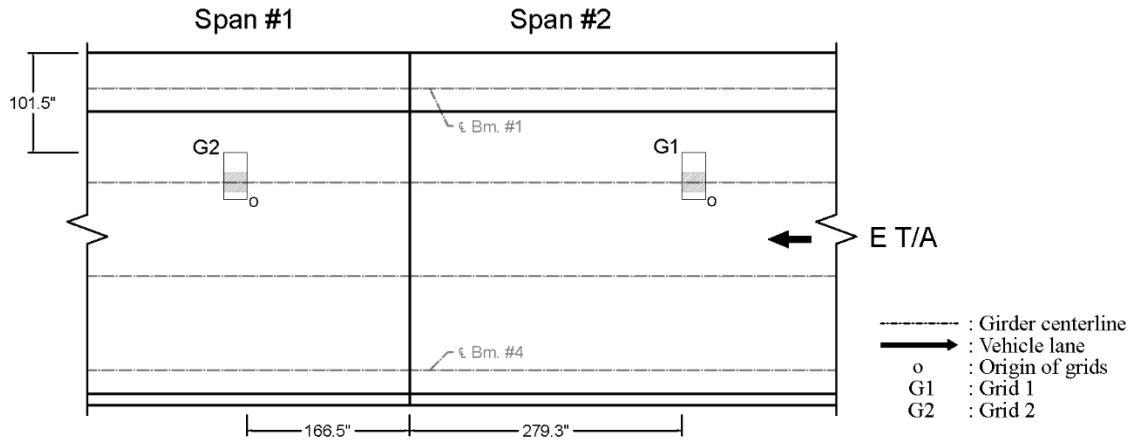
Plan View of the Bridge and Location of Two Grids
